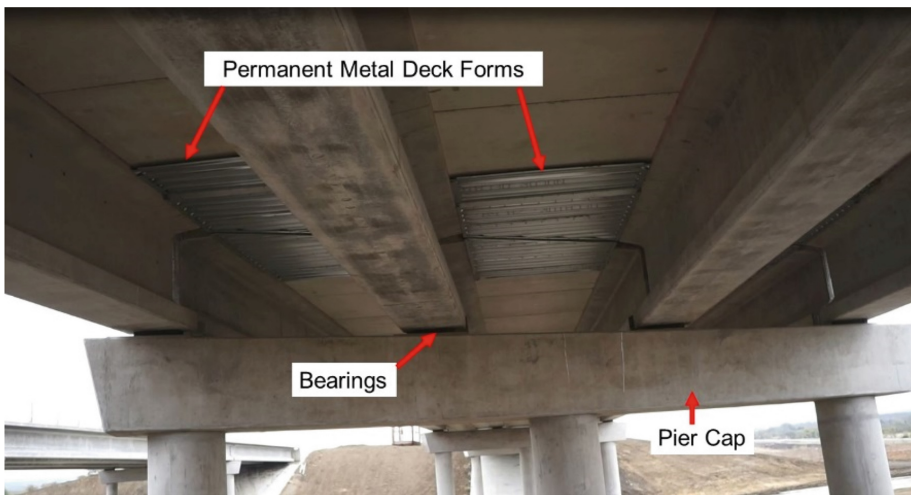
Under-bridge inspection of a concrete bridge.
